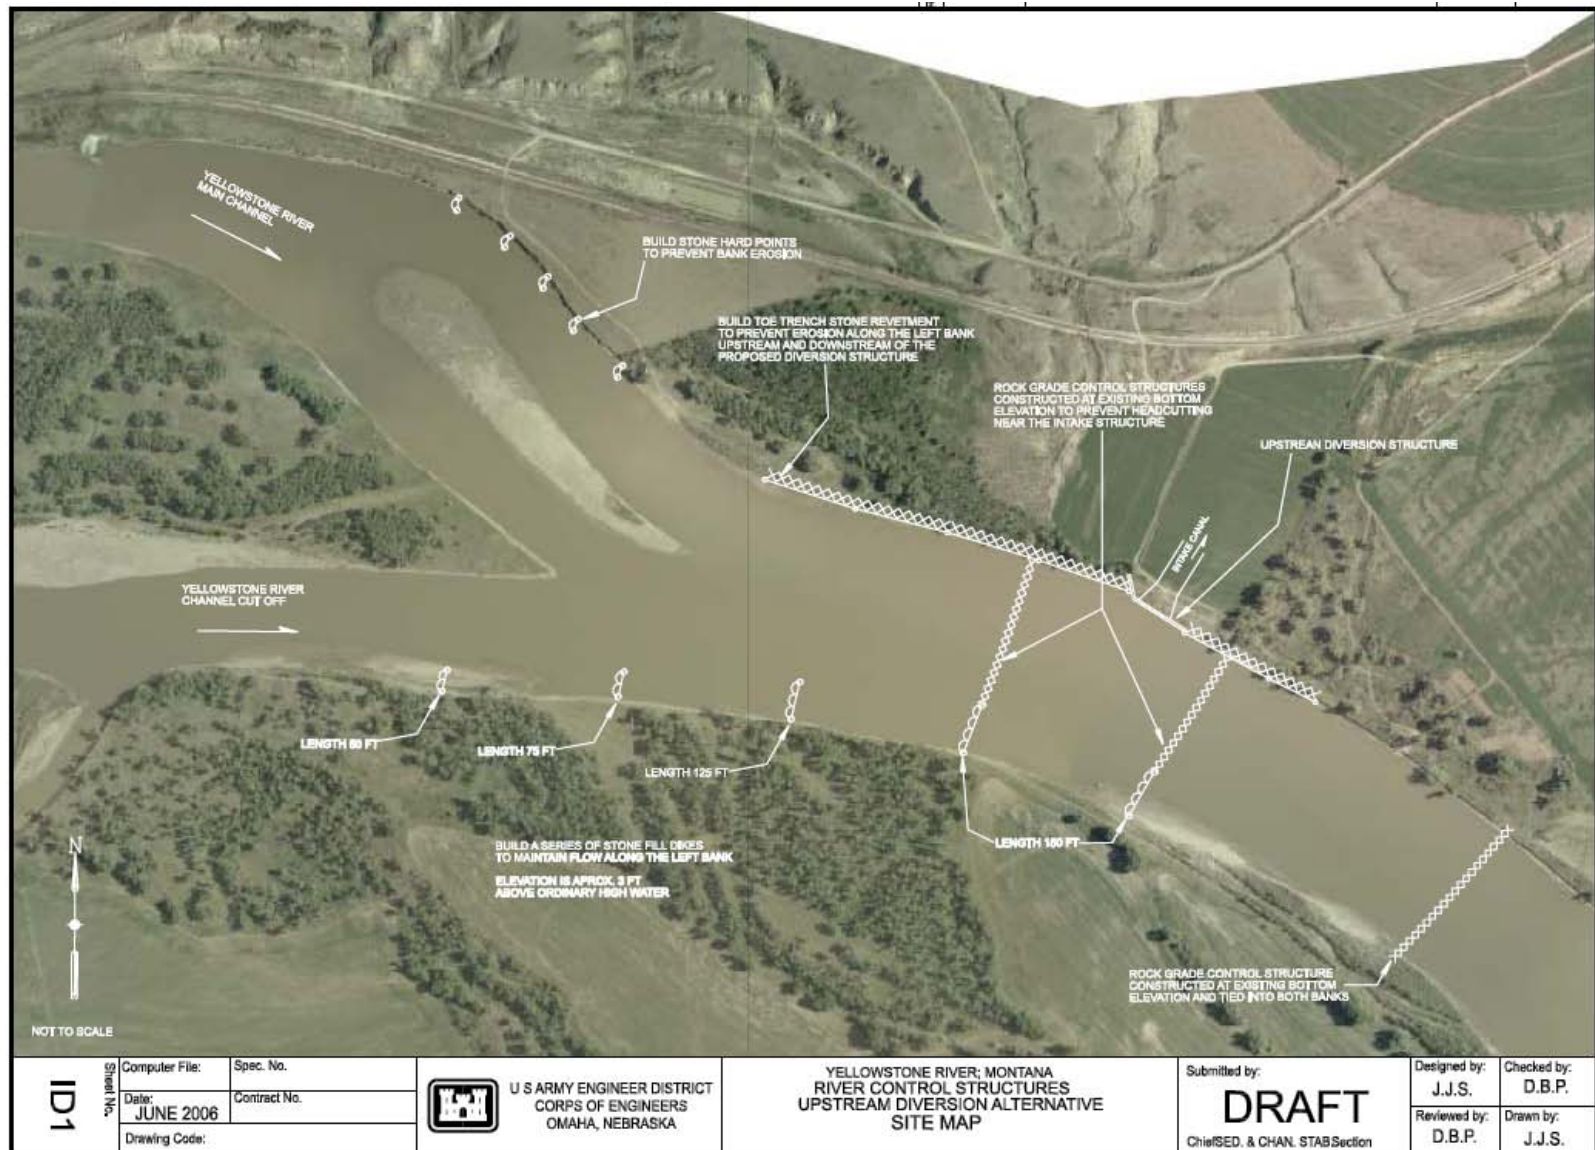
Plan View of Channel Stabilization Structures at Upstream Diversion Location
